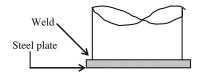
A pipe pile is covered with an end cap. The end cap is welded as shown.
